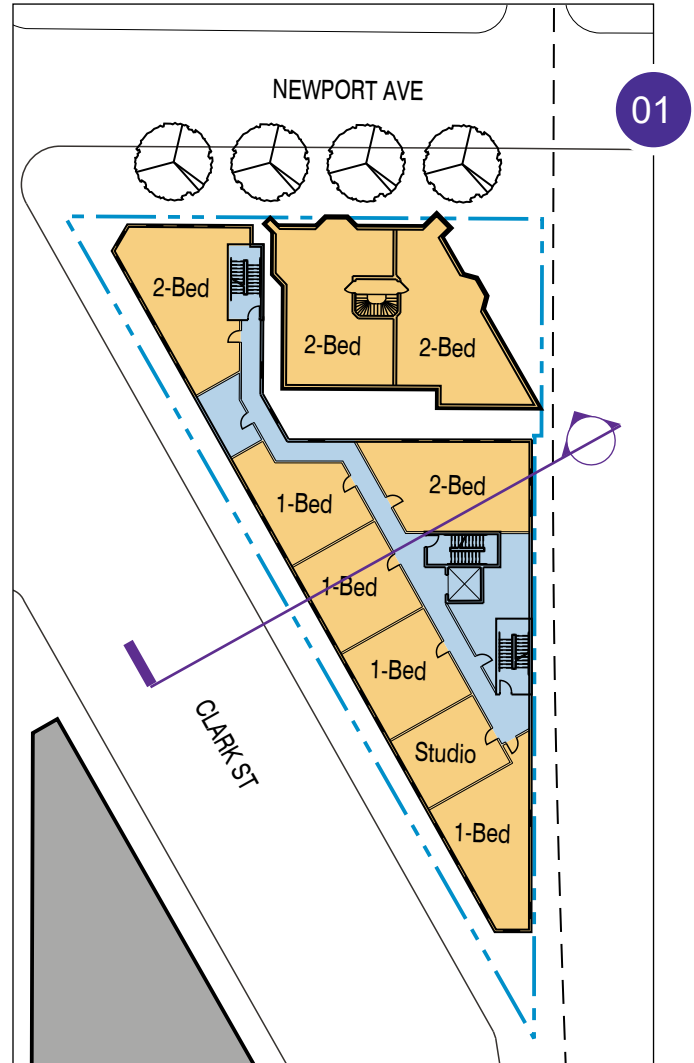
RPB 01 Development Concept Residential Floor Plan
